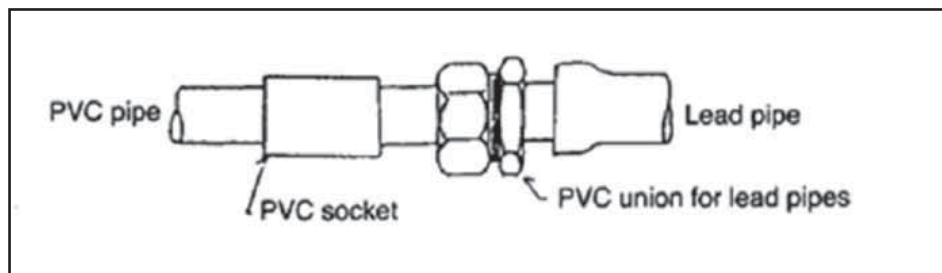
Connection between PVC lining lead pipe and PVC pipe
